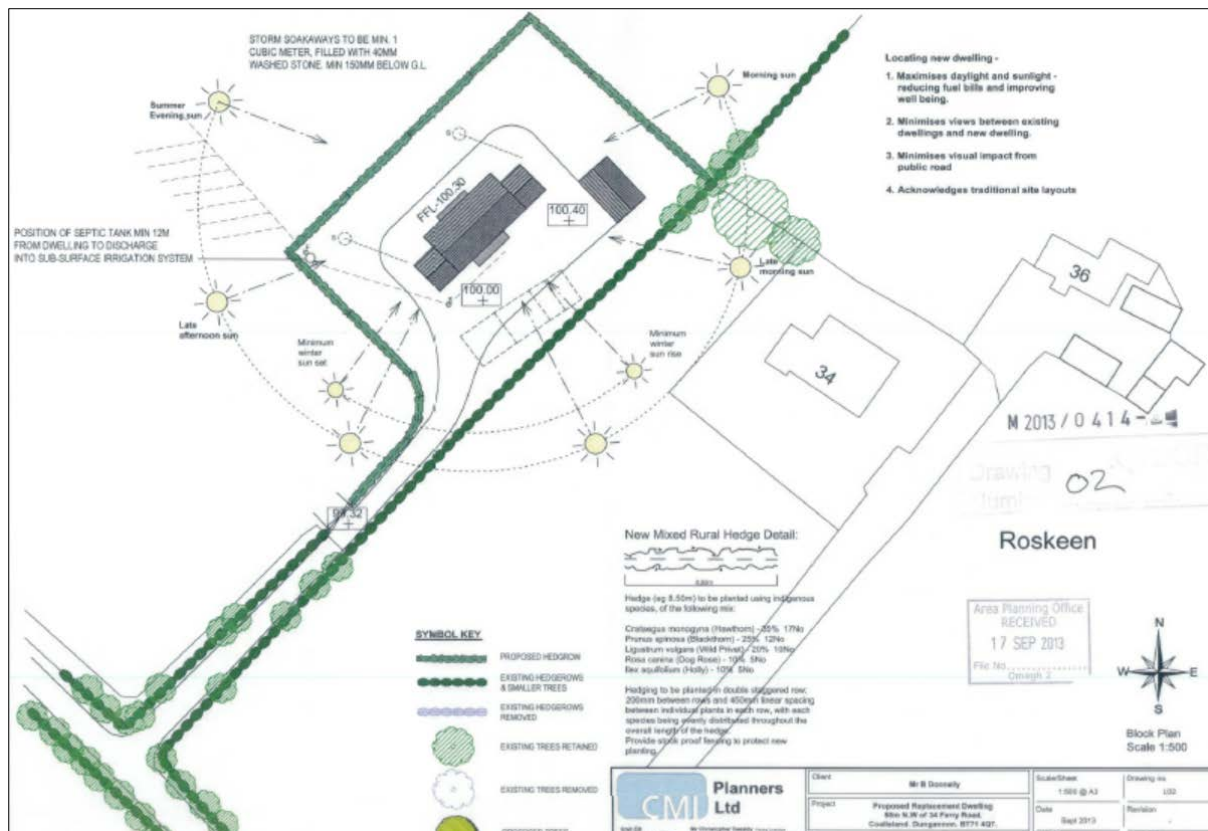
Block plan of dwelling and garage approved under M/2013/0414/F
